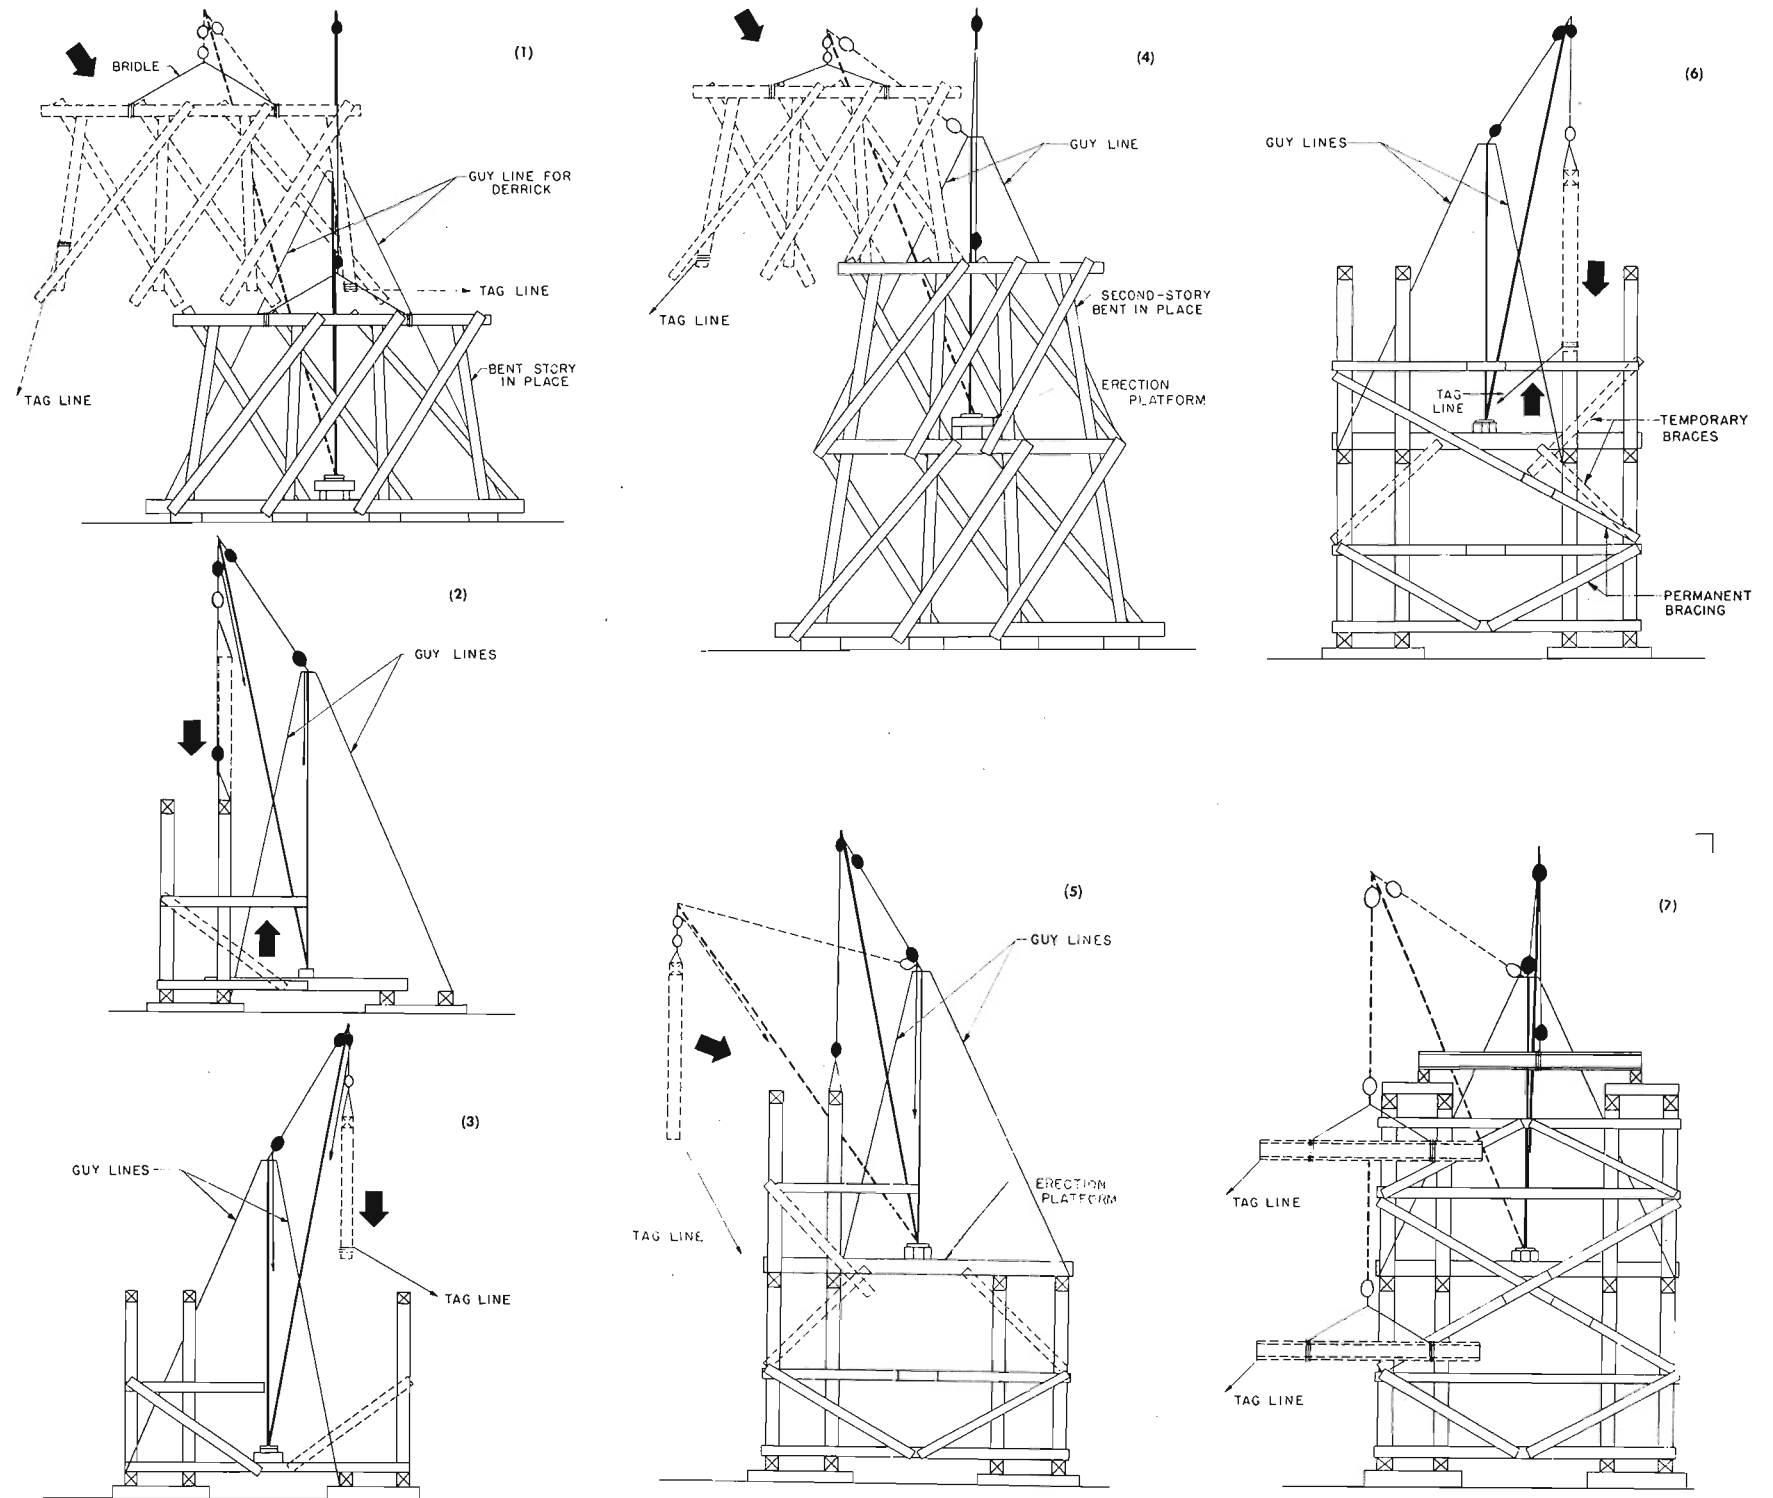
Sequence of erecting two-story timber tower with guy derrick made of bridge timbers
